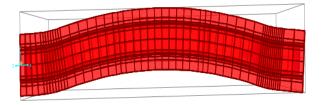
FIG: SHOWS THE TOP VIEW OF BOX GIRDER BRIDGE
